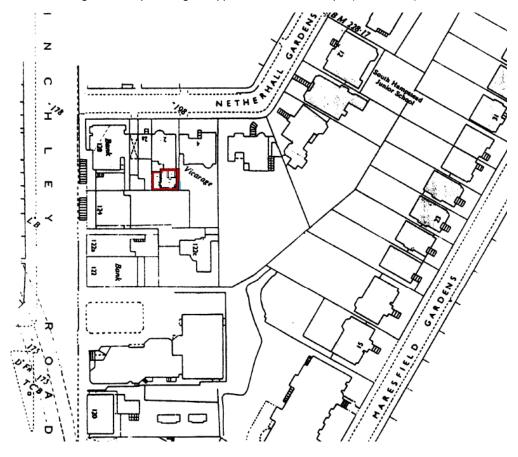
Site Location Plan with application site edged in red (not to scale)
